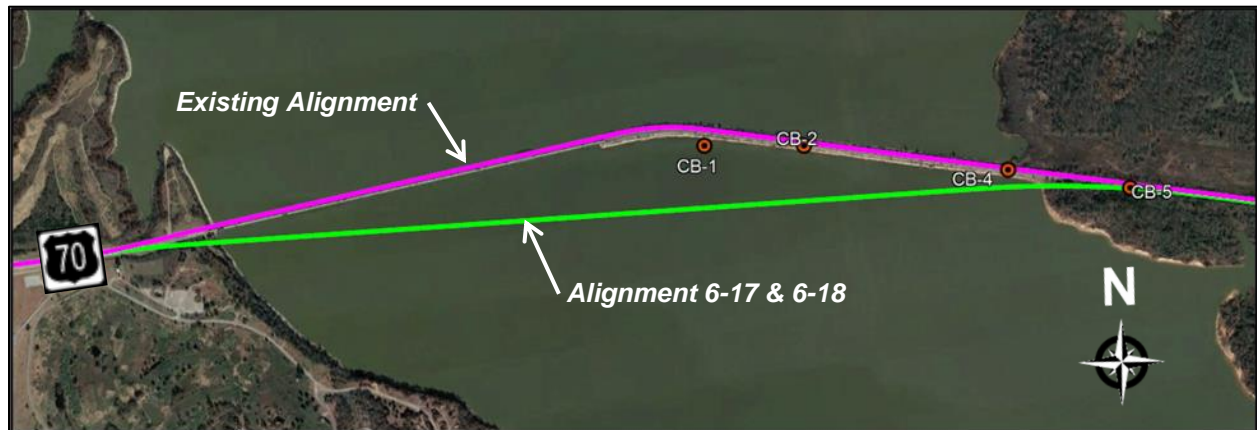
Preliminary Embankment (Causeway) Survey Boring Layout
